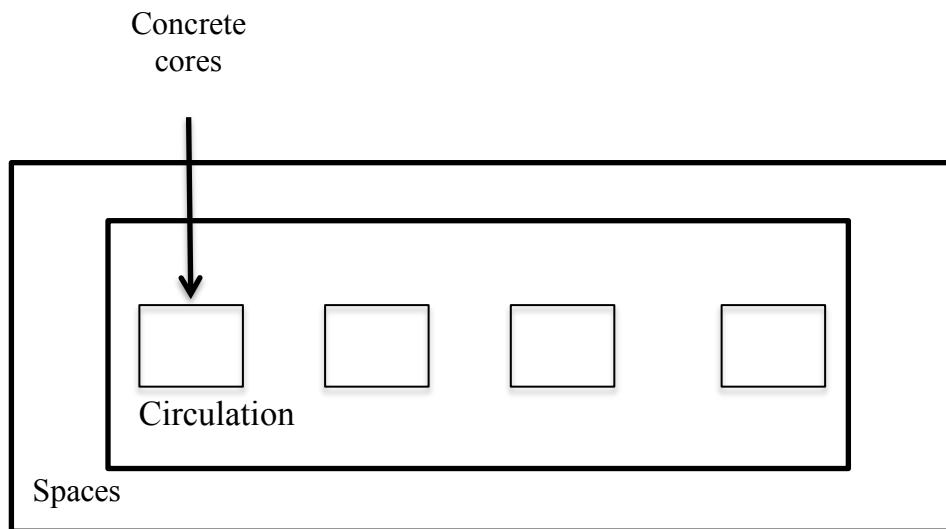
Use of spaces, circulation spaces, and concrete cores on the building floors
